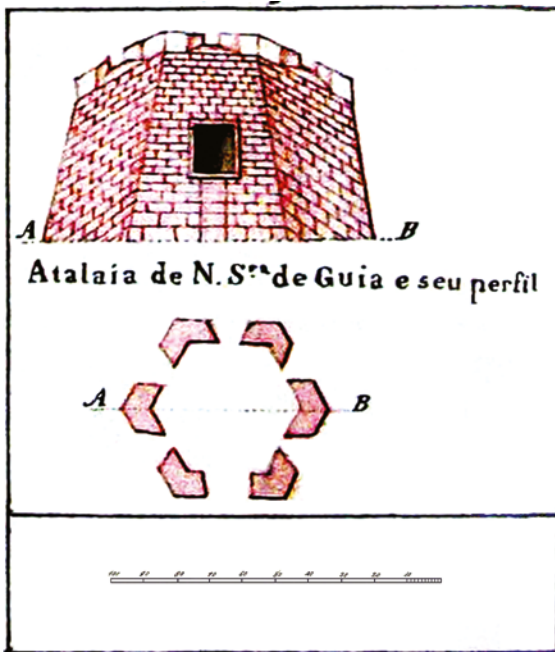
Watchtower of Our Lady of Guidance, plan and elevation. The only window shown indicates that the windows were at ground level. The means of ascent to the roof level – stairs or ramp – is not shown in the plan.
